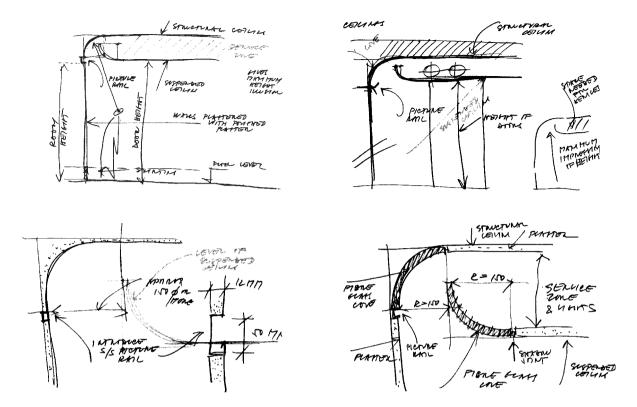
Early sketches from Eva Jiricna's design process showing a line of thought about the junction between wall and ceiling
